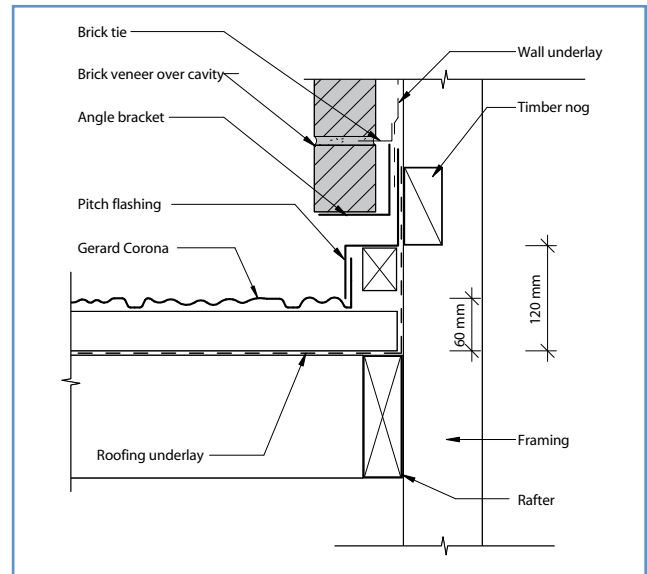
Nogging and positioning of pitch flashing for installation
